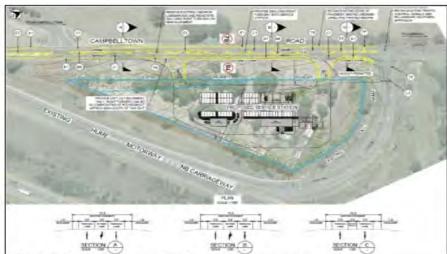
Concept Layout Site Plan. Source - J. Wyndham Prince
